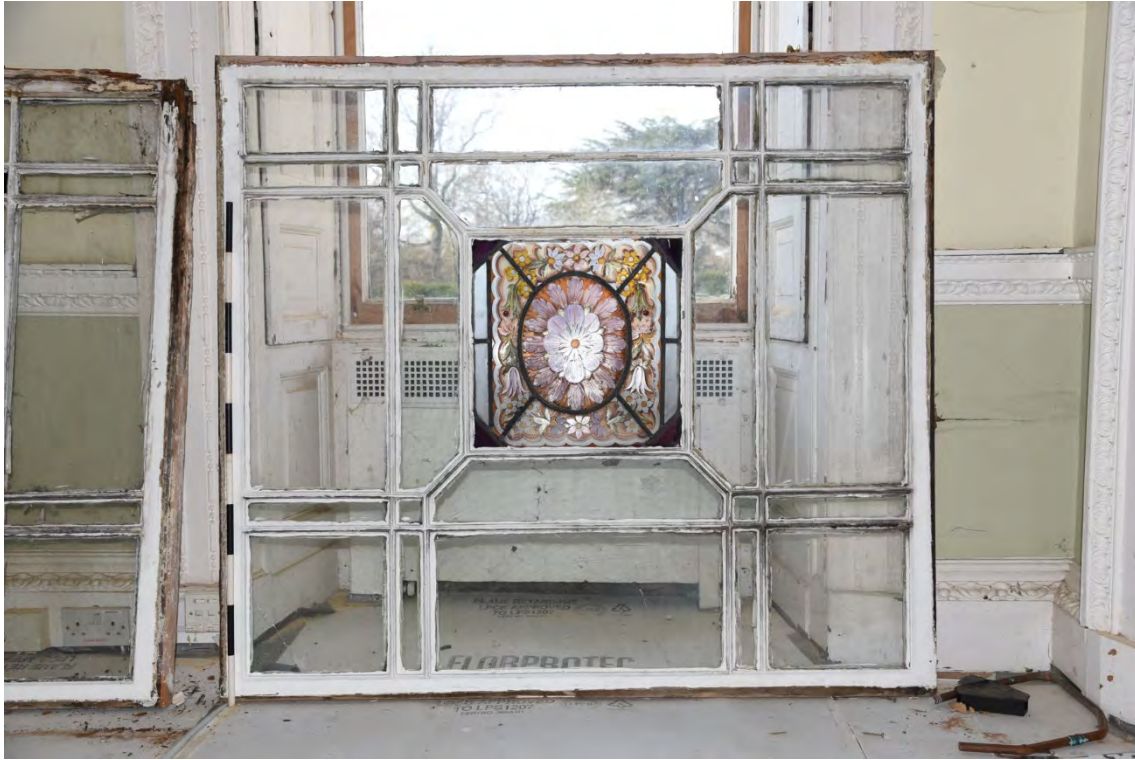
Window panel removed from the lantern's S elevation, interior view (BRH185)
